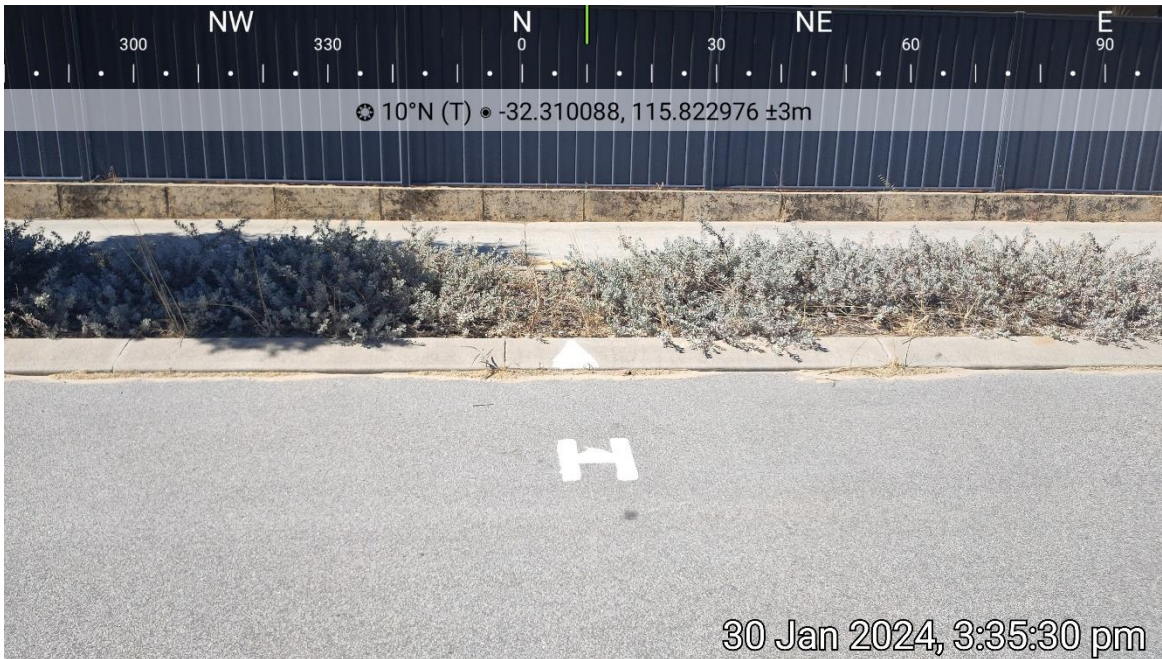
External Hydrant installed external to site (within 100 m of subject site).
